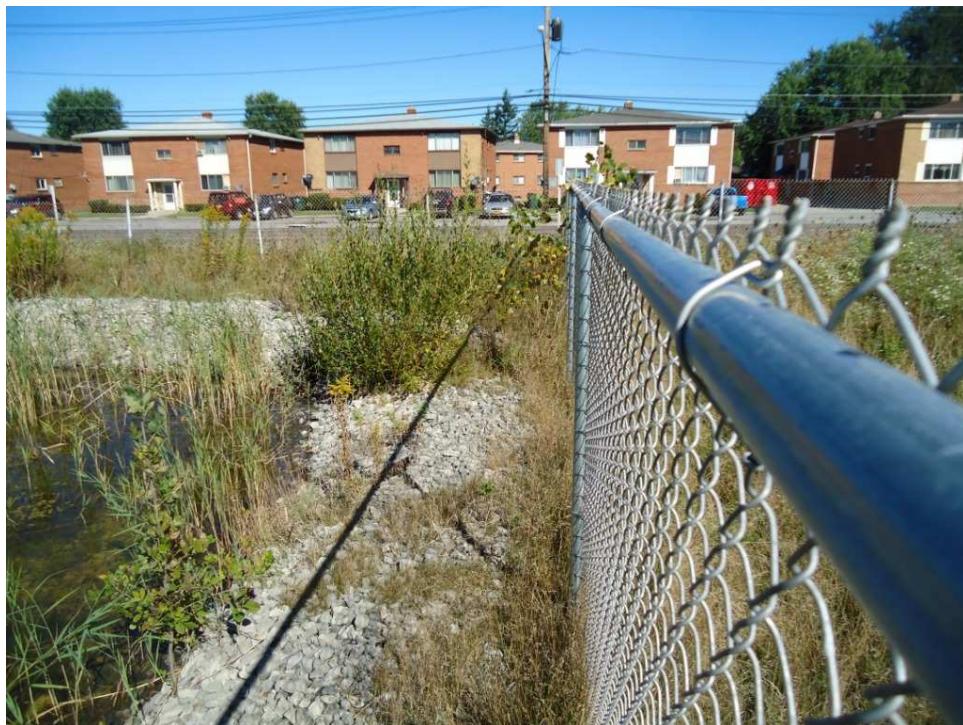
Retention pond looking north. Outlet pipes in northeast corner of pond.
